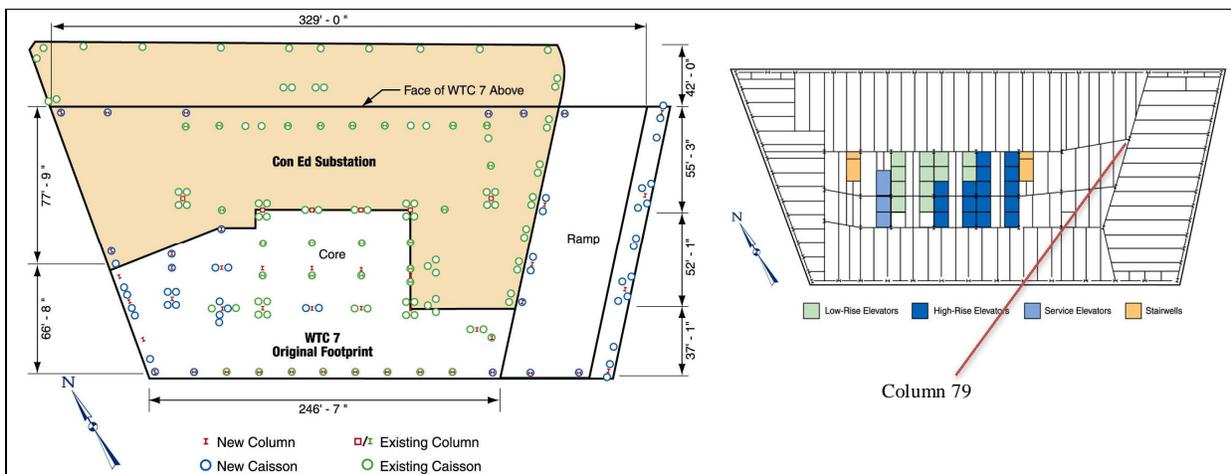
WTC 7 Foundation Layout and Typical Framing Plan
